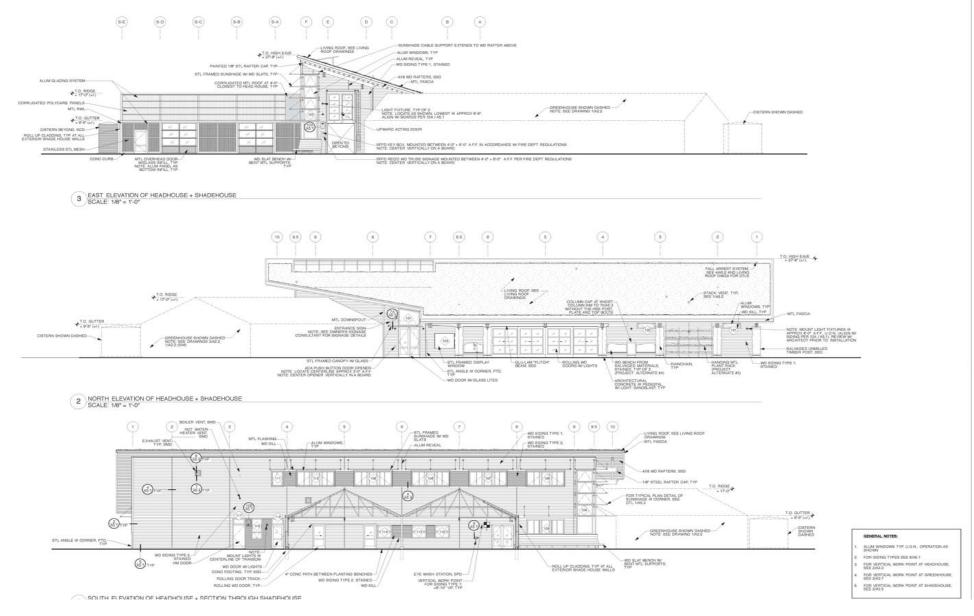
Proposed Nursery: Center for Sustainable Gardening Elevations
